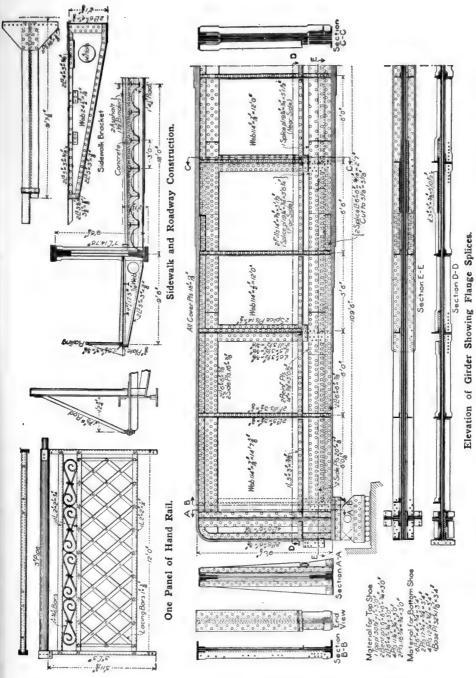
Details of 109-ft. Plate Girder Highway Bridge. (Engineering Record, May 21, 1910.)
